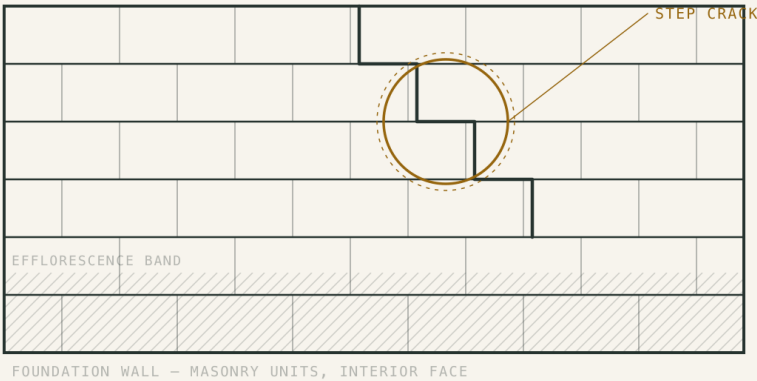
Foundation wall — step cracking and moisture band ILLUSTRATIVE SAMPLE
